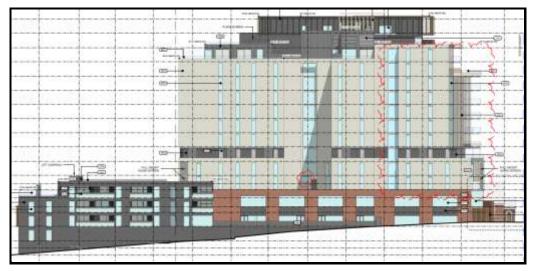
Original Eastern façade proposal (earlier development plan elevation)
